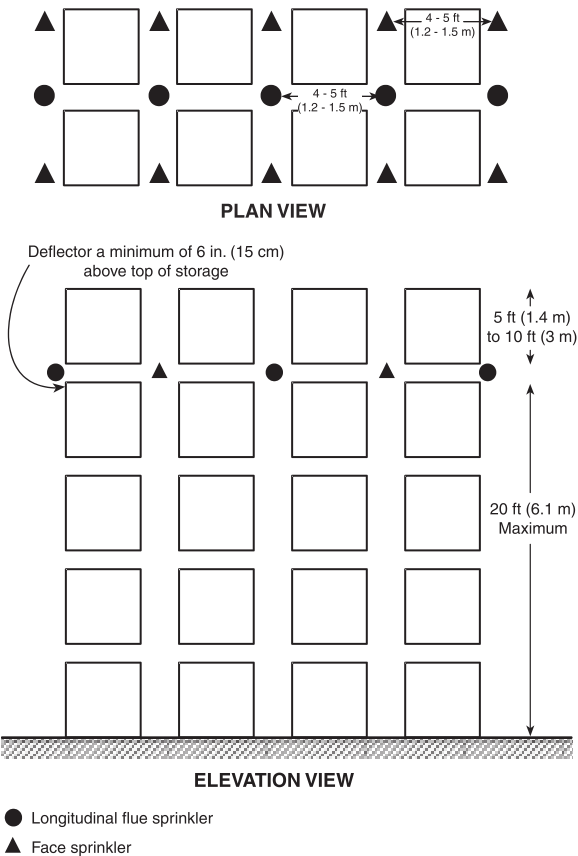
(b) Double-Row Rack Sprinkler Layout for Design Scheme “F.” (Multiple row racks shall extend the same sprinkler pattern through the rack.)
